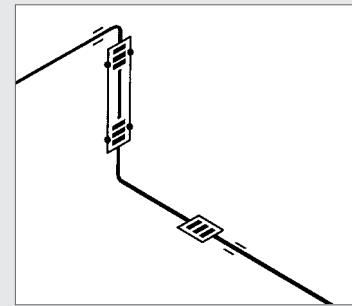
3-dimensional, three-hinge system with lateral and angular expansion joints
